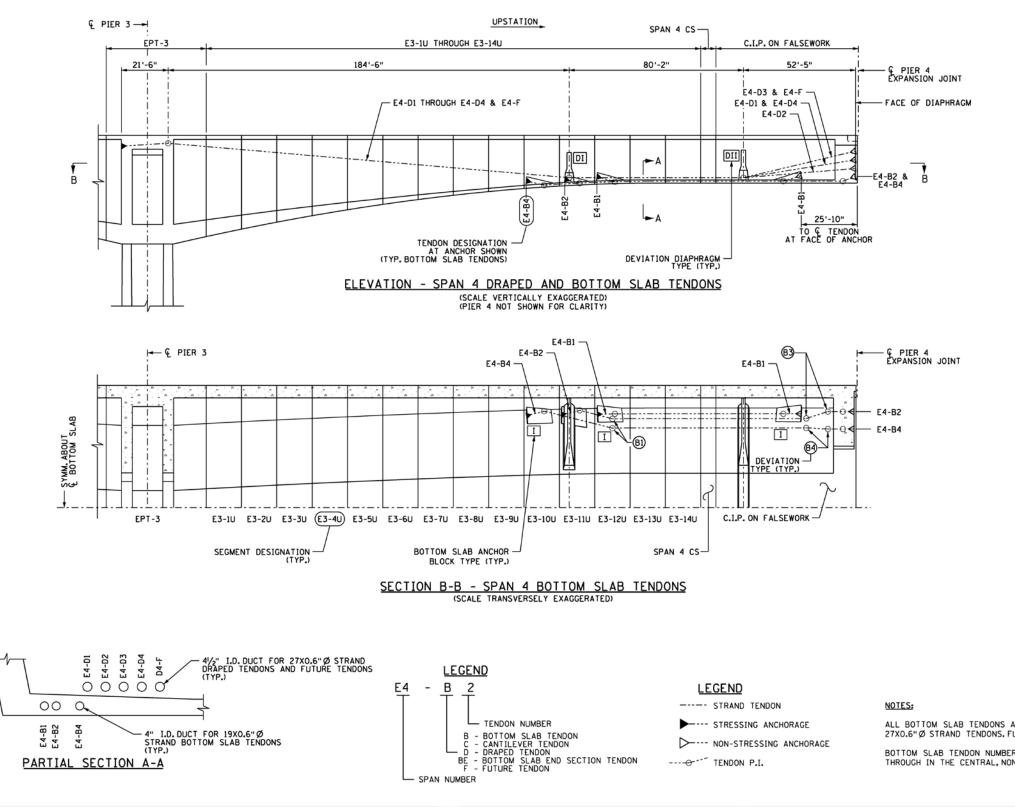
Eastbound Span 4 Draped and Bottom Slab Post-Tensioning Layout
